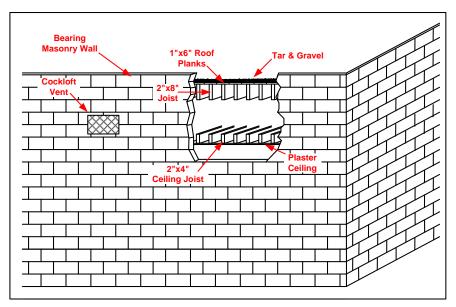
The Cockloft is the Void Space between the Top Floor and the Flat Roof
